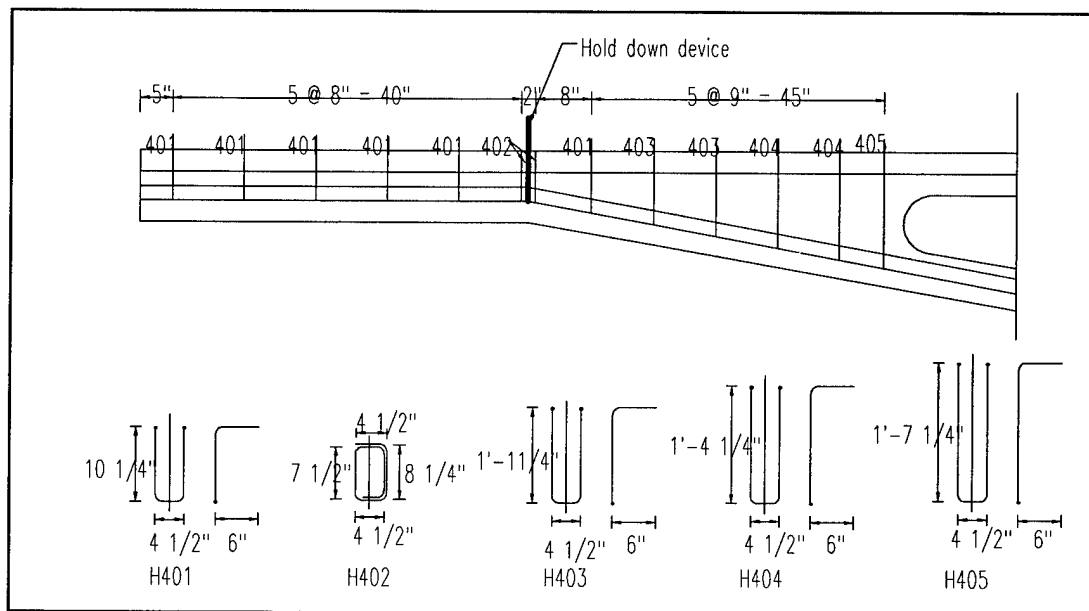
HJ-1 and HJ-2 web reinforcement details.
